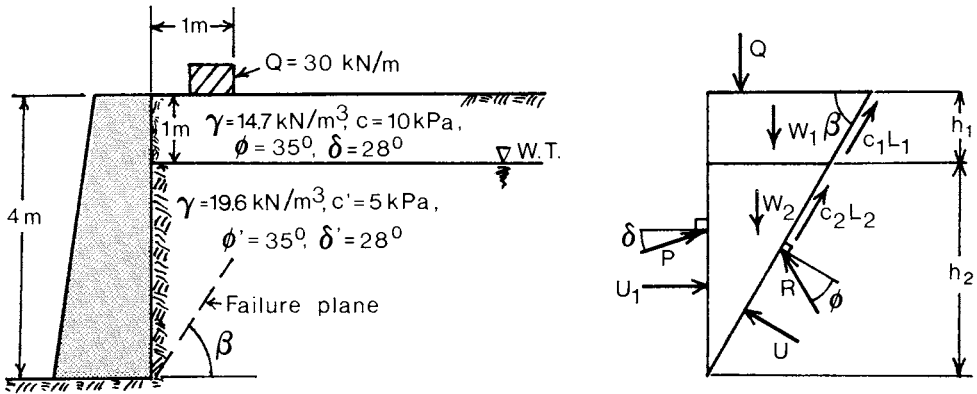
A layered soil behind a retaining wall in Problem 6.1.
